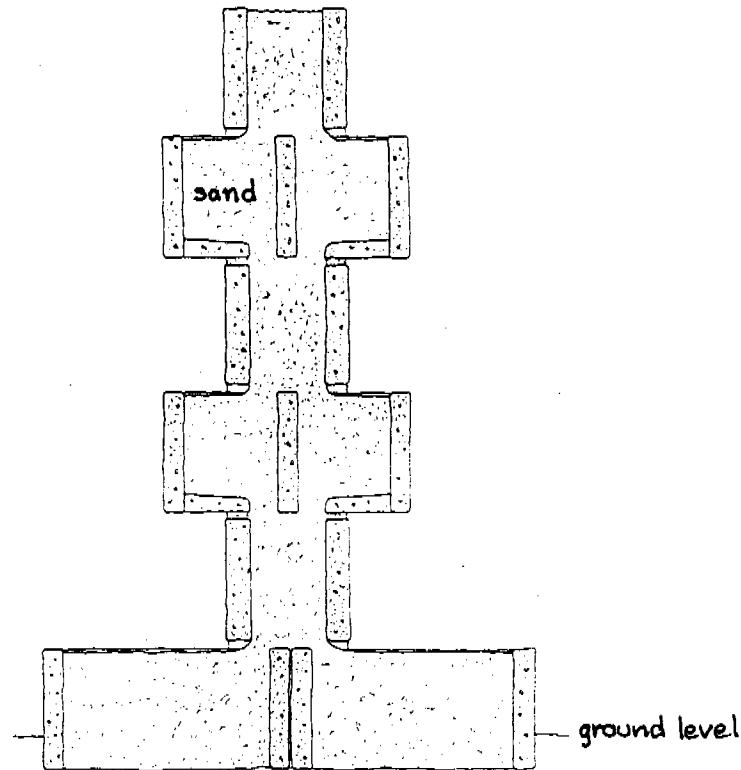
Section through double sided growing wall. In this case all the cavities of the wall are filled with sand.
